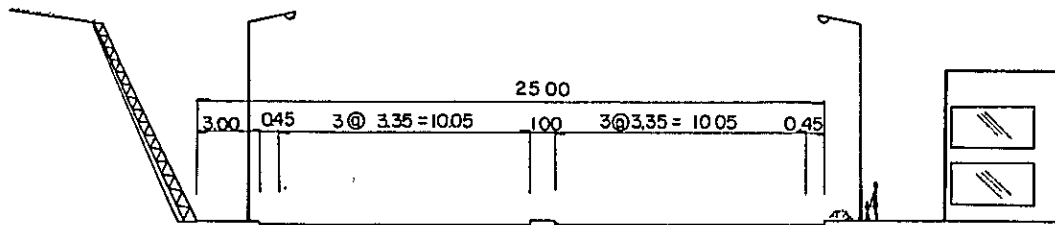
WIDENED CROSS SECTION OF VIA ESPANA(2)
